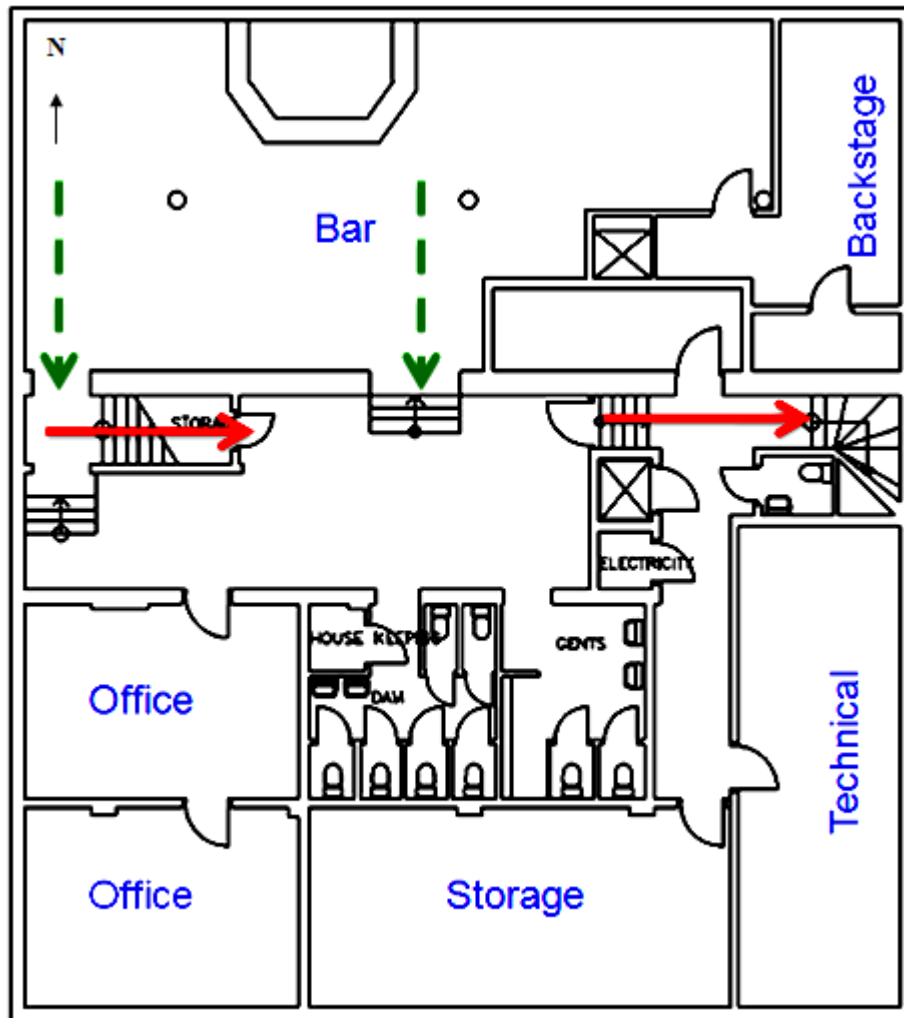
Floor plan of the proposed nightclub – Basement (Floor 0)
